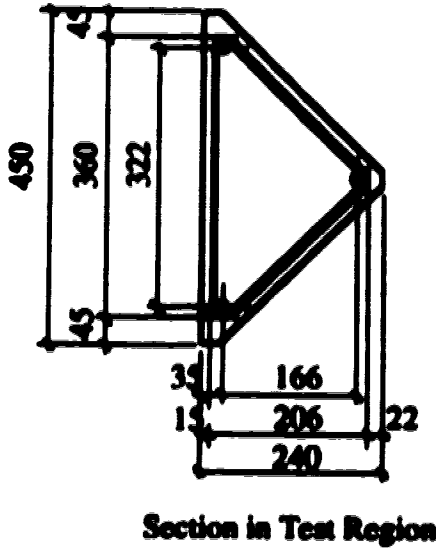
Details of Reinforcement for the Triangular Specimens
